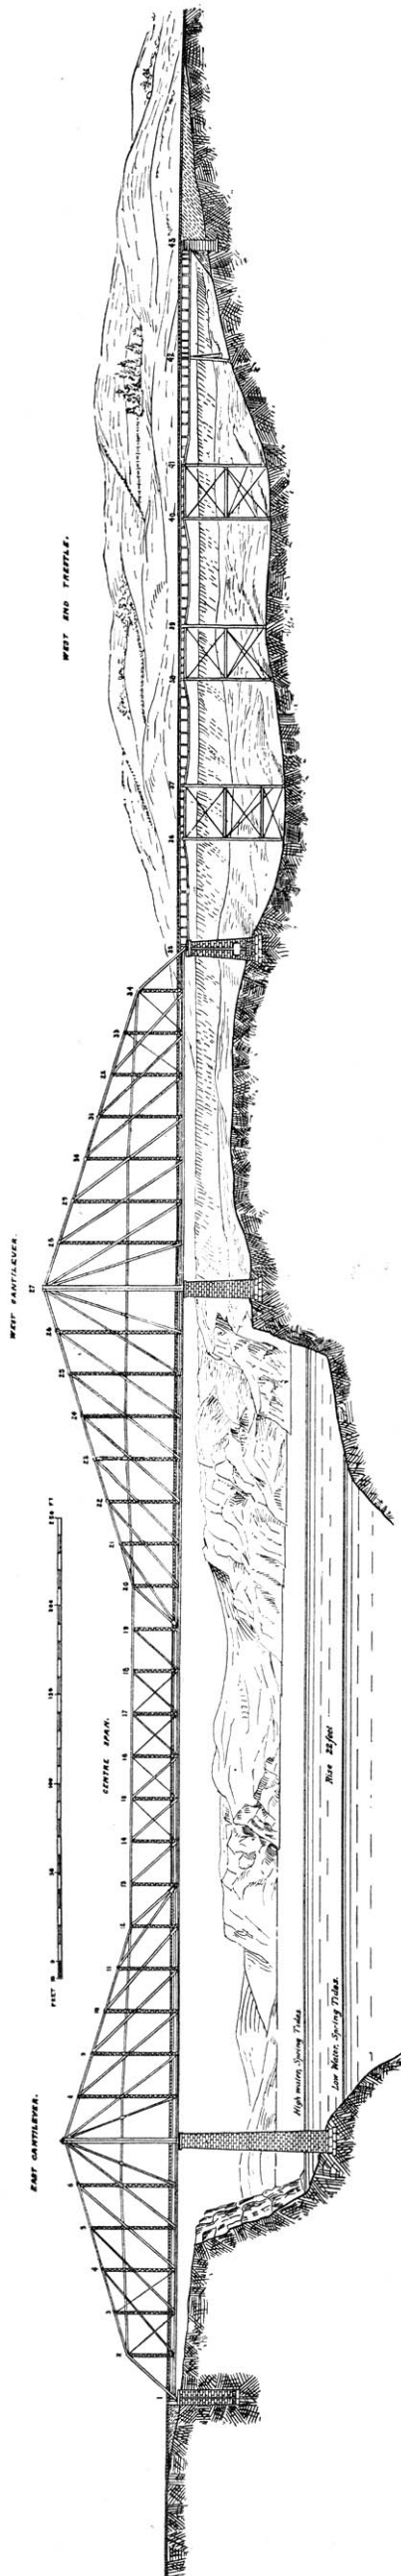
STEEL CANTILEVER BRIDGE AT ST. JOHN, N. B.—SIDE ELEVATION, LOOKING DOWN THE RIVER.
